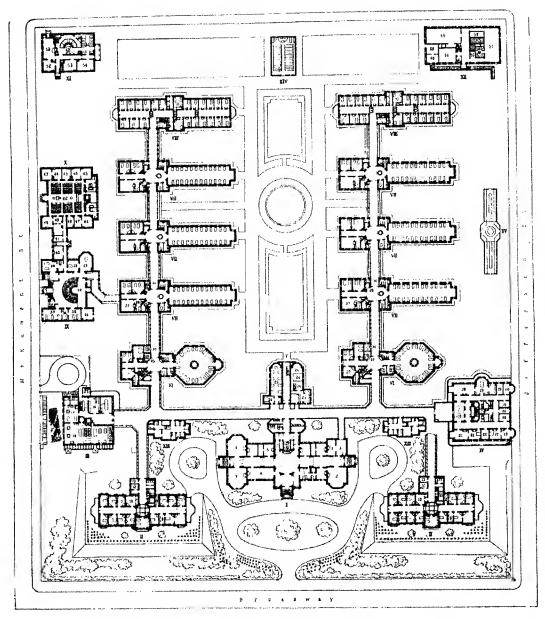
Final plan for Johns Hopkins Hospital (John S. Billings's second plan) 1876.
